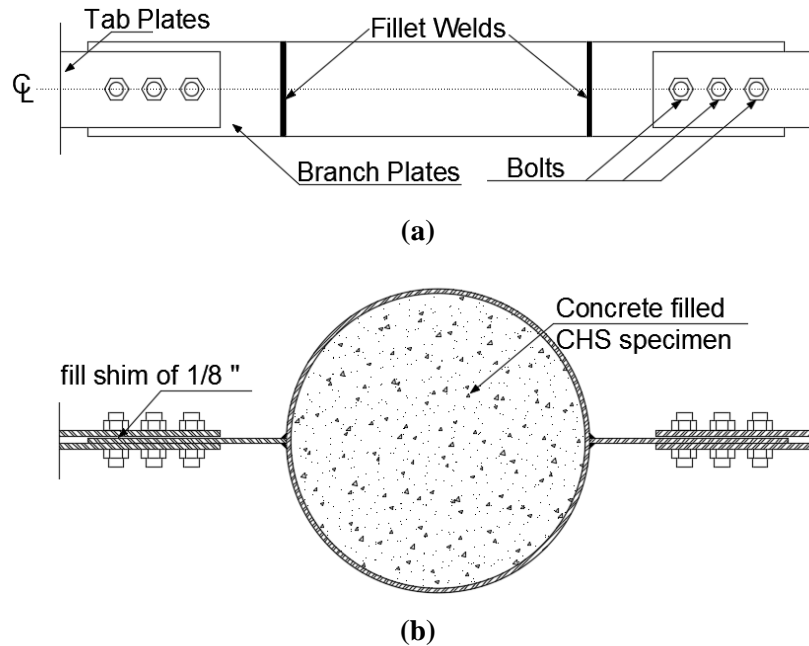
Tab plates, branch plates and CHS connections for specimen with CHS diameter of 16": (a) top view; (b) side view
